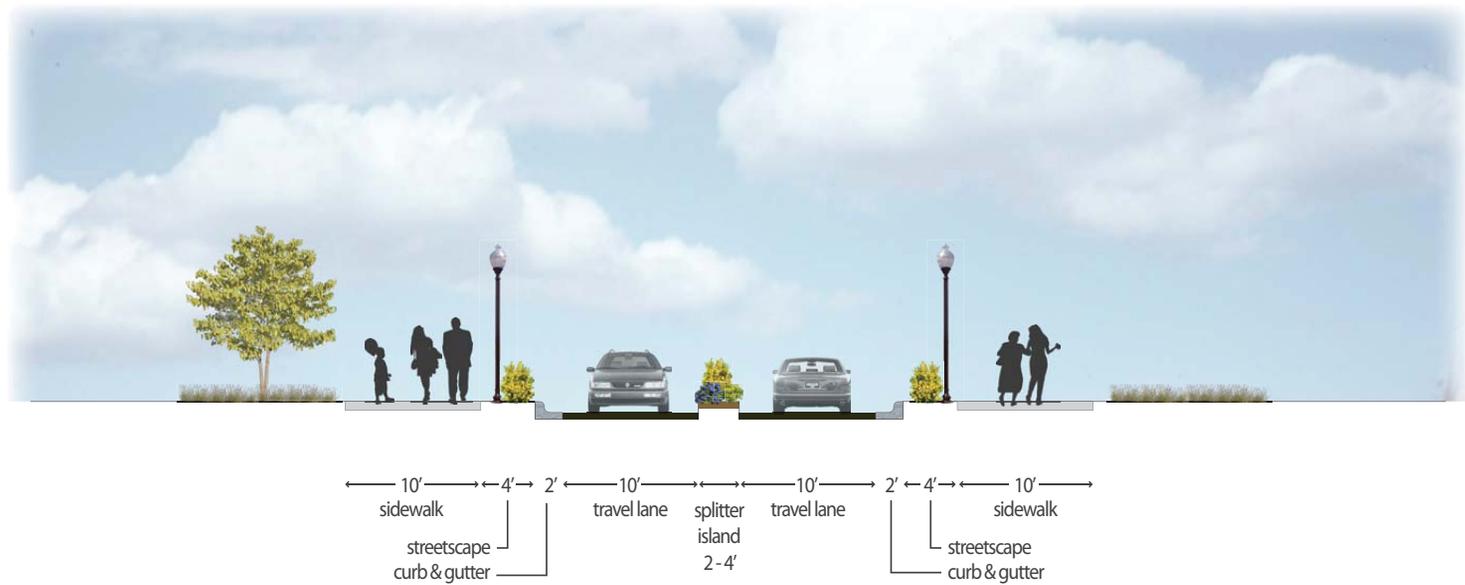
Typical Section: Holcomb Bridge Road: Key Intersections with Splitter Islands
